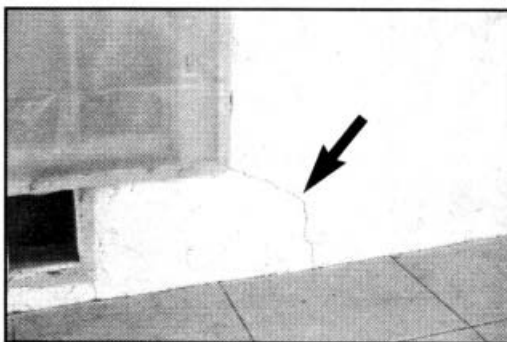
Minor cracking to exterior stucco. All of the cracking to the exterior stucco is minor. This is one of the larger cracks.
